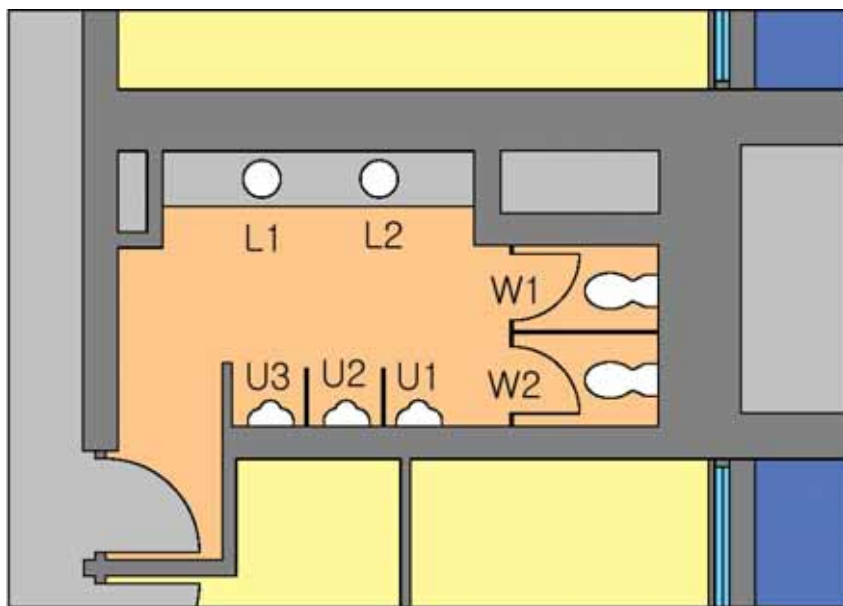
Second, third, and fourth floor men's restroom floor plan (Seo, 2003)
